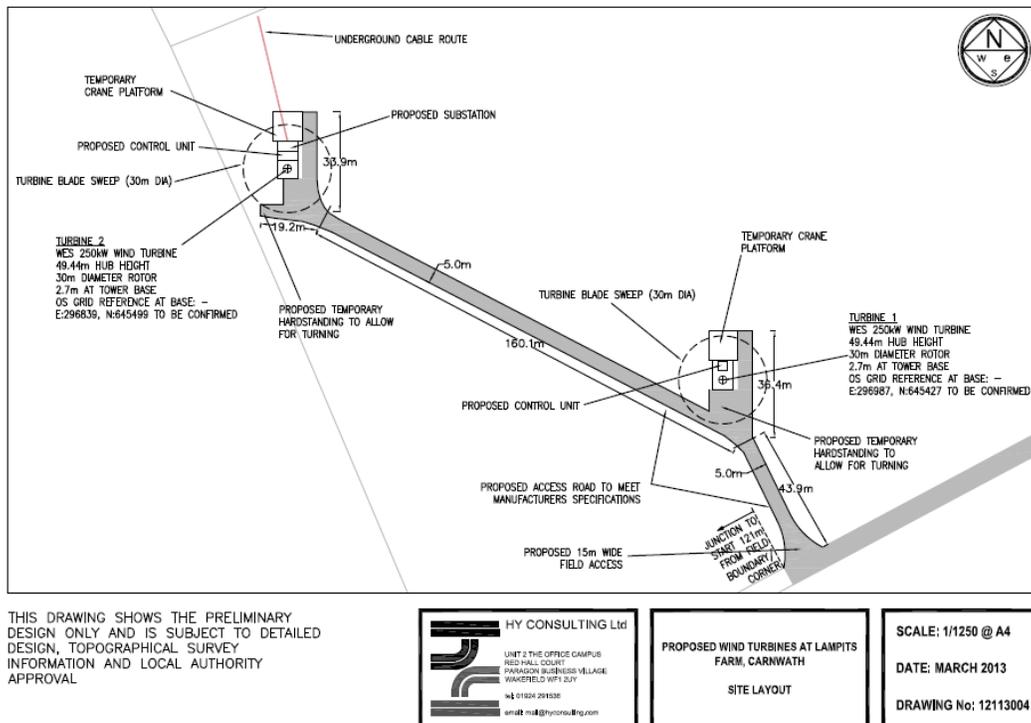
Detailed site lay-out plan (HY Consulting Ltd. as provided by AEC Wind Ltd.)
